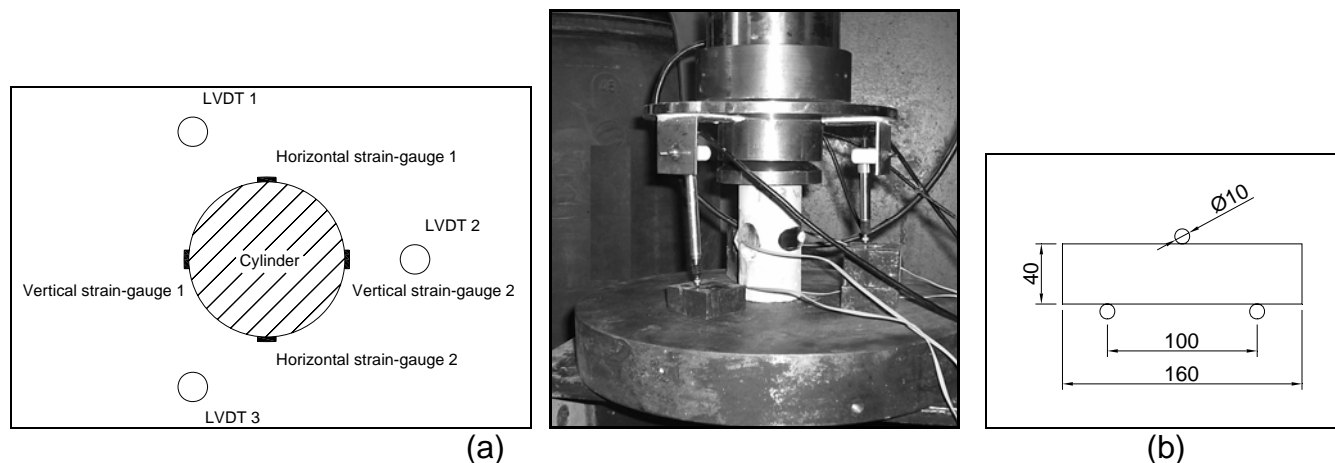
Details of the experimental tests: (a) compressive test in cylinder specimens and (b) flexural tests in prismatic specimens
